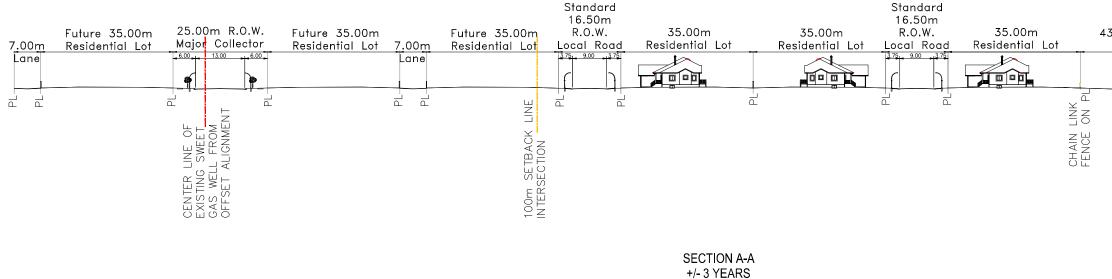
COPPERWOOD STAGE 2 OUTLINE PLAN AMENDMENT
